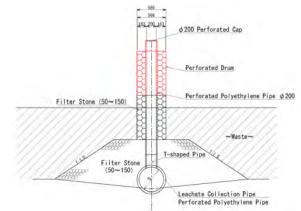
Typical Cross Section of the Gas Exhausted Pipe
